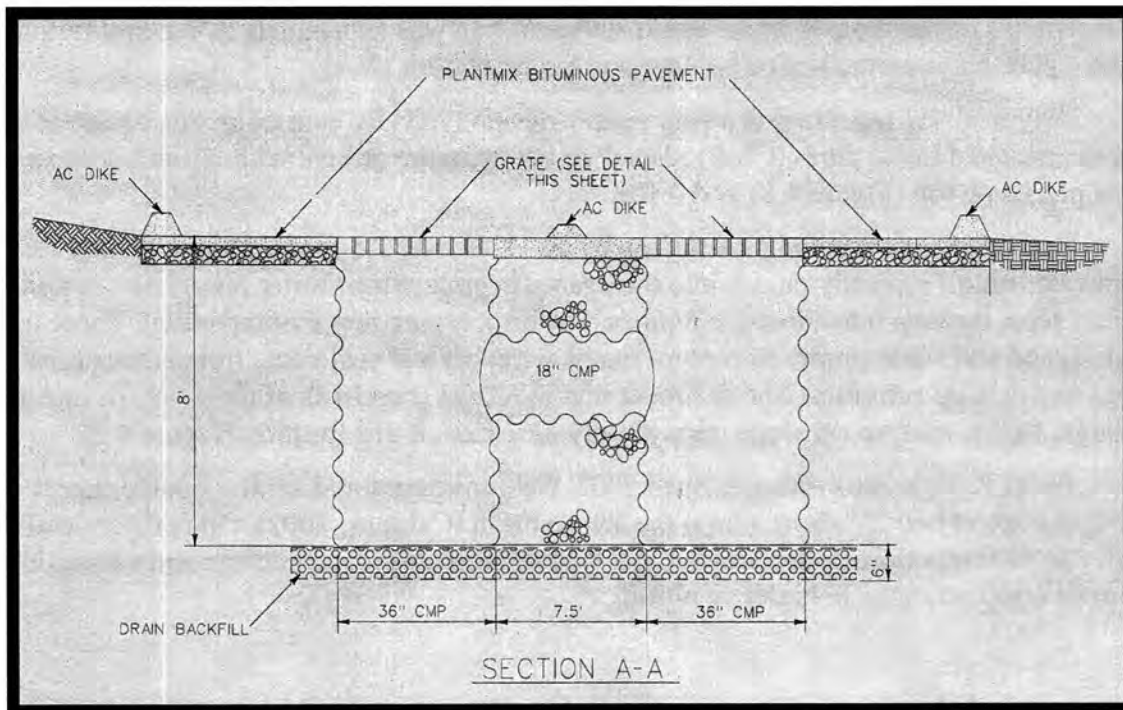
Cross-sectional view of a typical NDOT sediment trap BMP.
